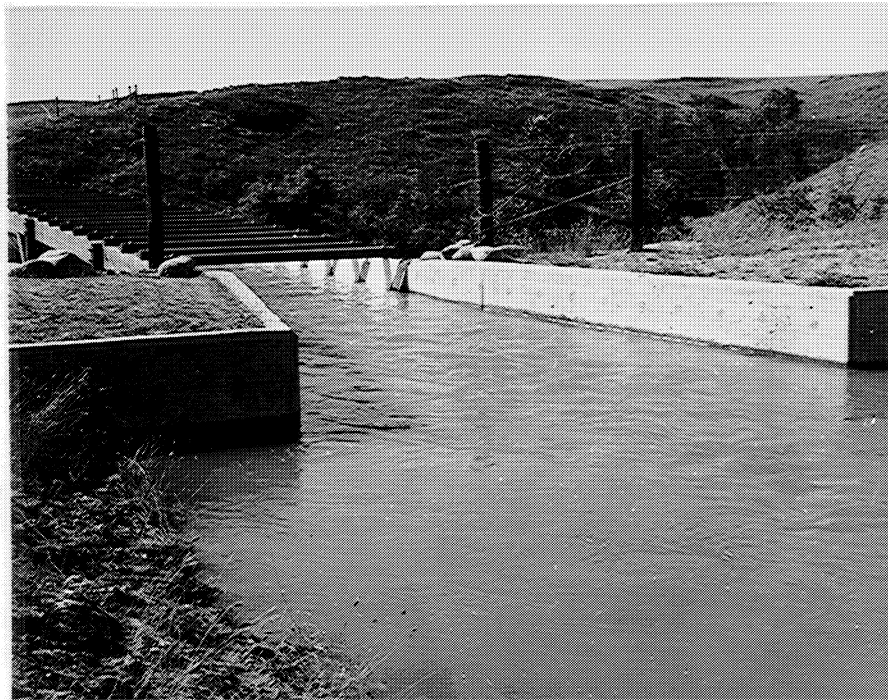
Flume Outlet Transition, Elbow, Saskatchewan
